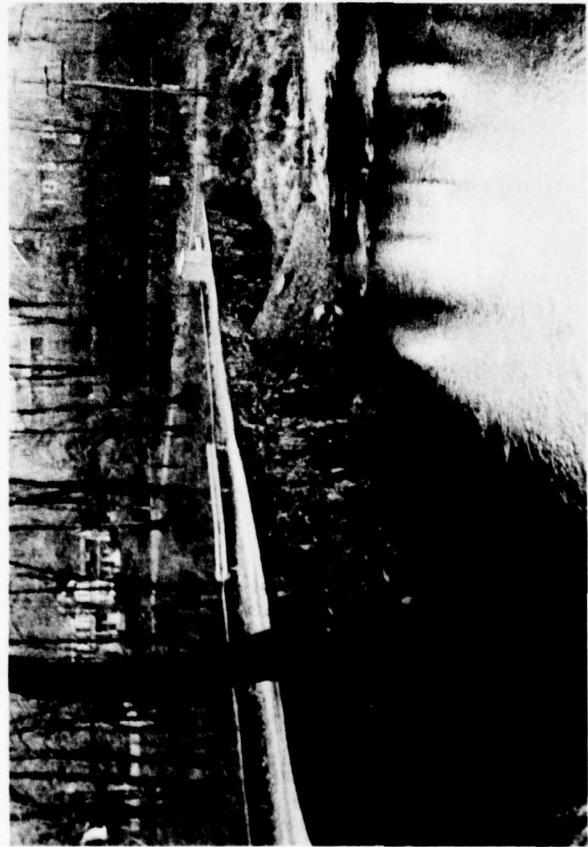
Bridge and houses $\frac{1}{4}$ mile downstream.
